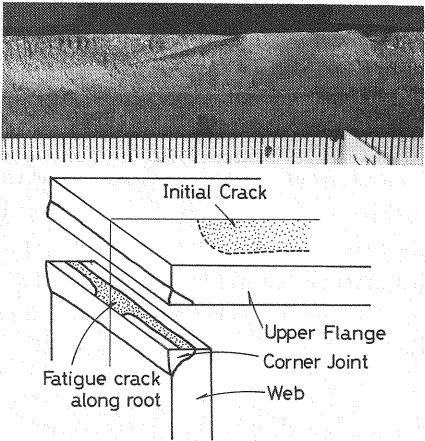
Fatigue Crack along Root of Corner Weld.
